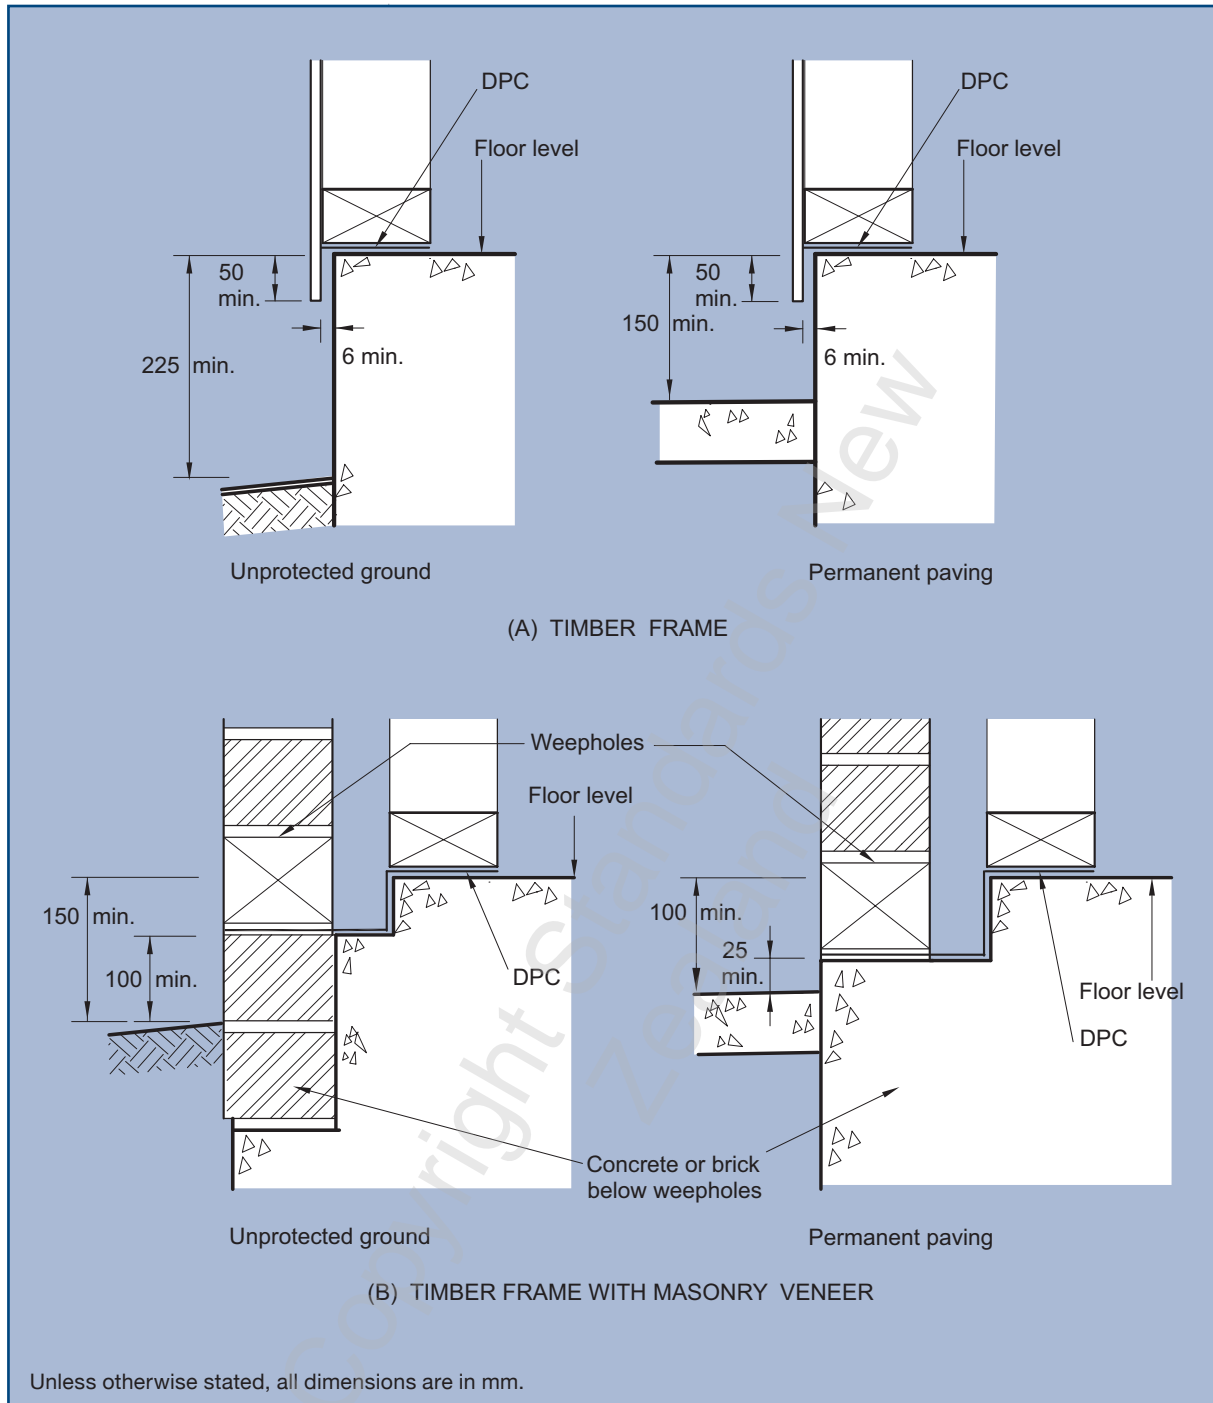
Minimum heights of finished concrete (residential, habitable) slab-on-ground floors above adjoining finished ground level (see 7.5.2.1)
